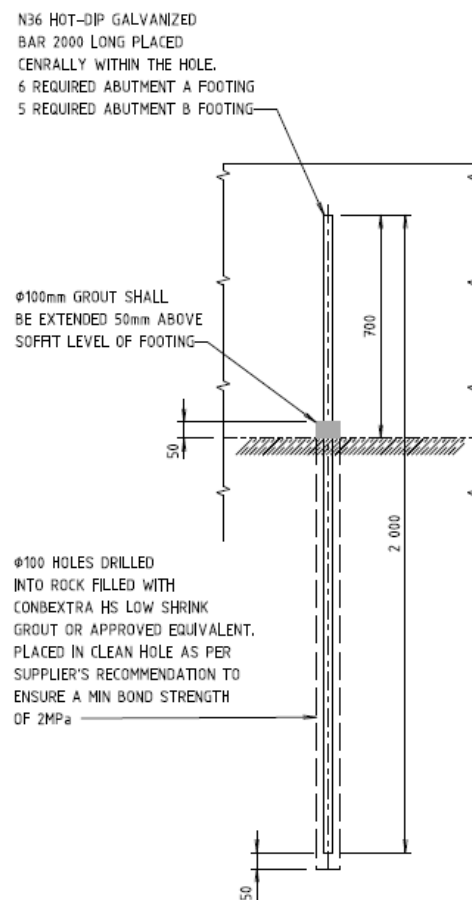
Abutment A layout (RMS [annotated], 2016)
